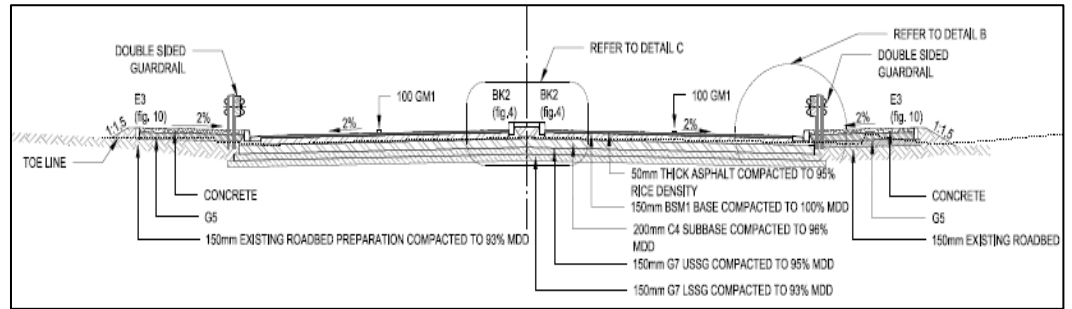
Typical Cross section from km 26.05 to km 26.13
